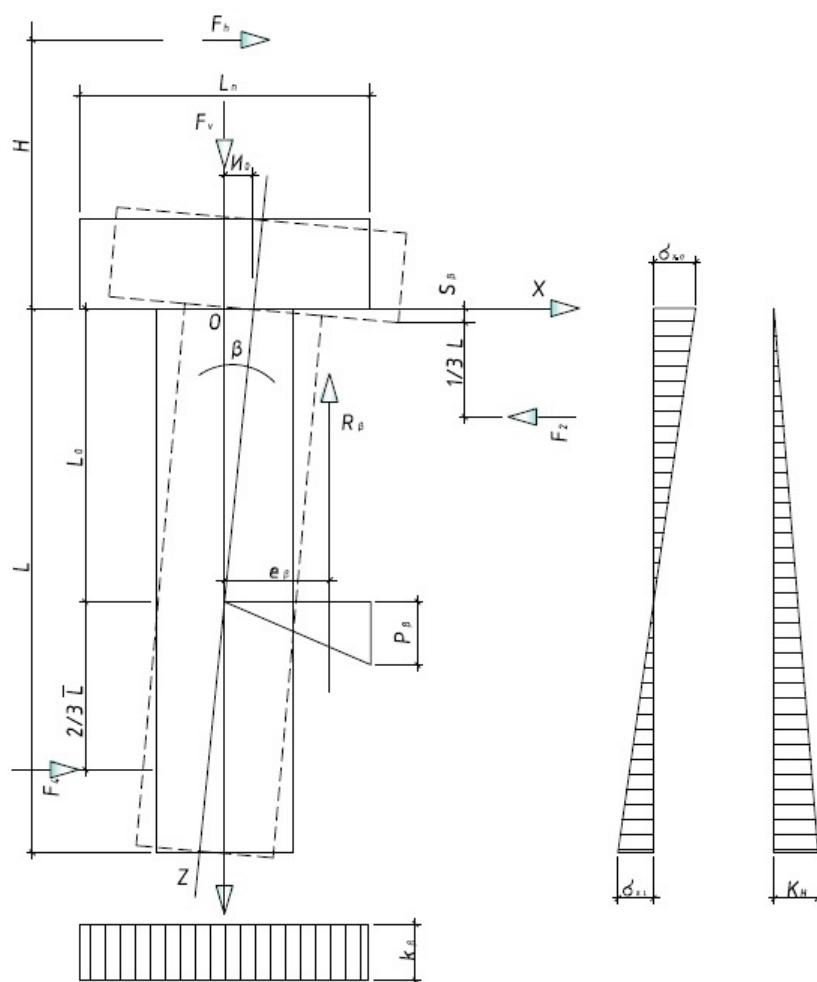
Calculation scheme of horizontally loaded short pile with the widening at the top
